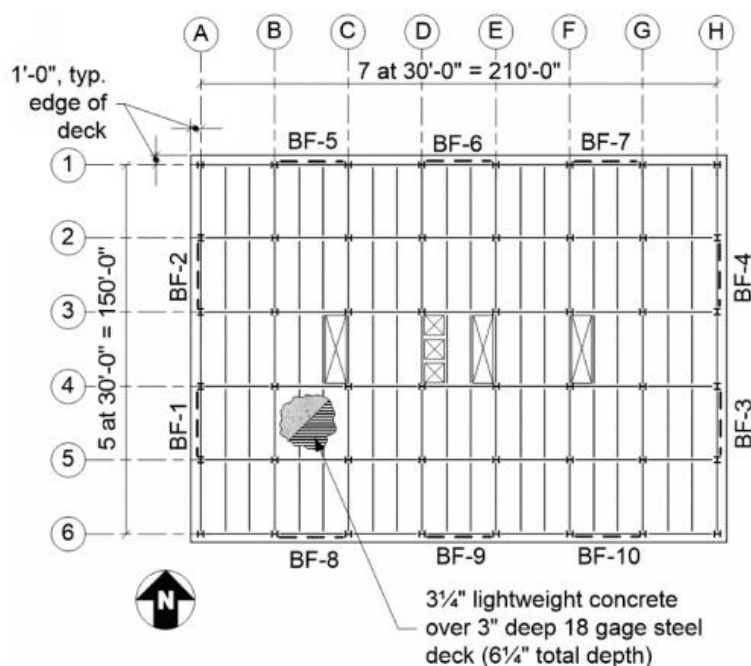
FEMA P-2006 steel braced frame design example typical floor.
